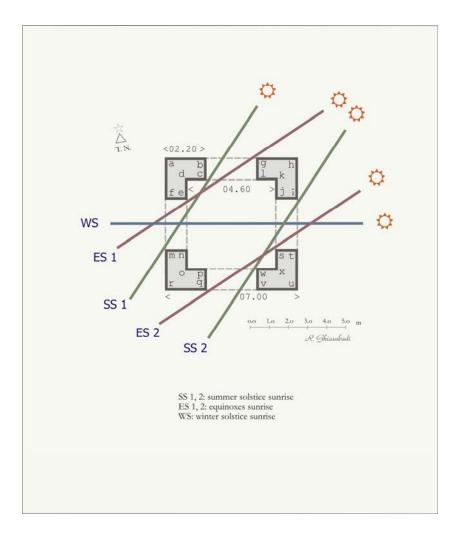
The floor plan and sightlines of Kahak Tetrapylon
